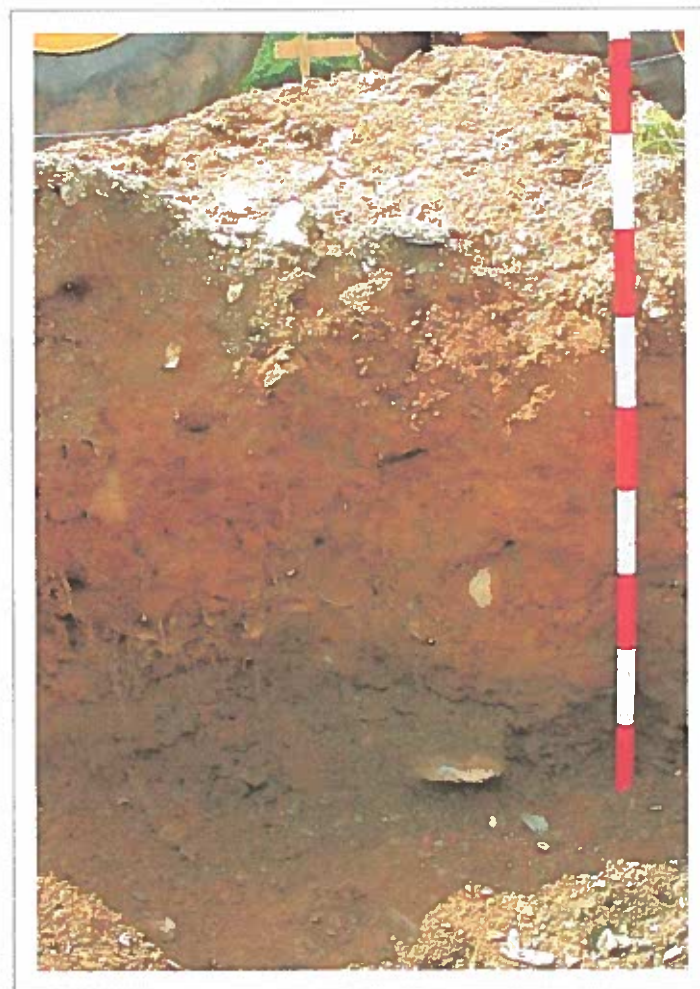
Shot of Plot 8 following excavation of footings, looking west.
